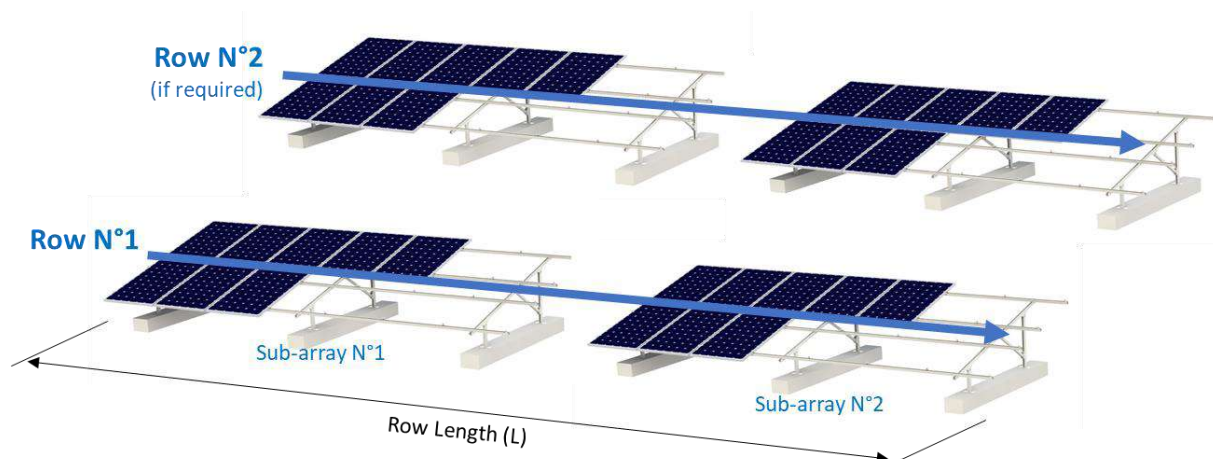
PV array layout and definition (valid for ground-mounted or rooftop installations)
